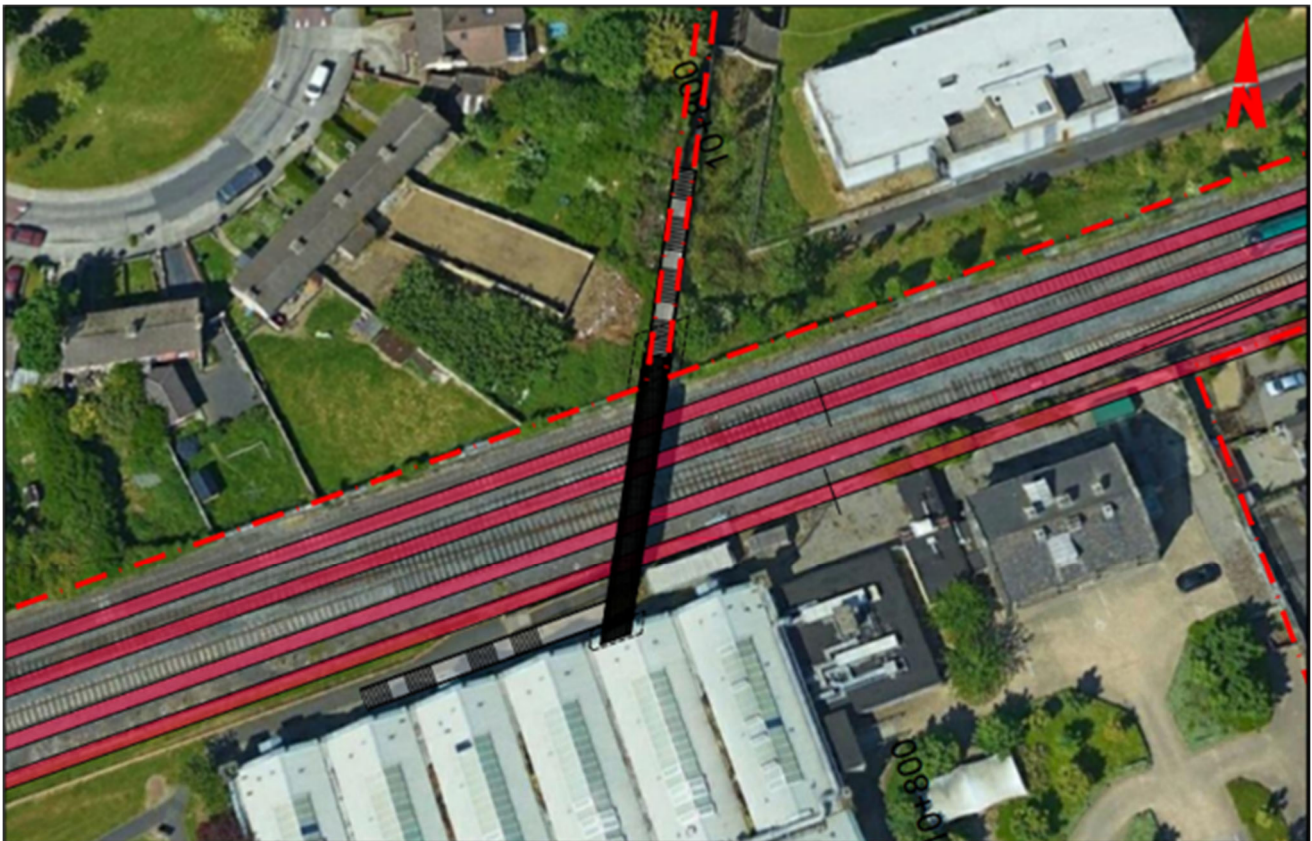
Khyber Pass Footbridge (OBC5) General Arrangement
